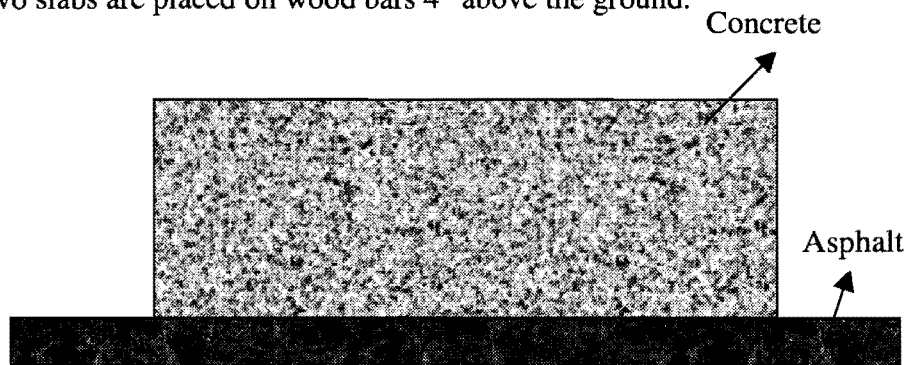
(a) Concrete slab on top of an asphalt layer
